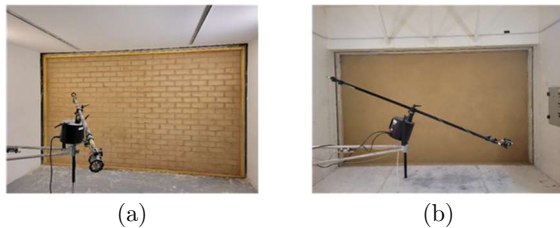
Extruded raw earth brick wall tested: (a) bare, (b) coated one side.
